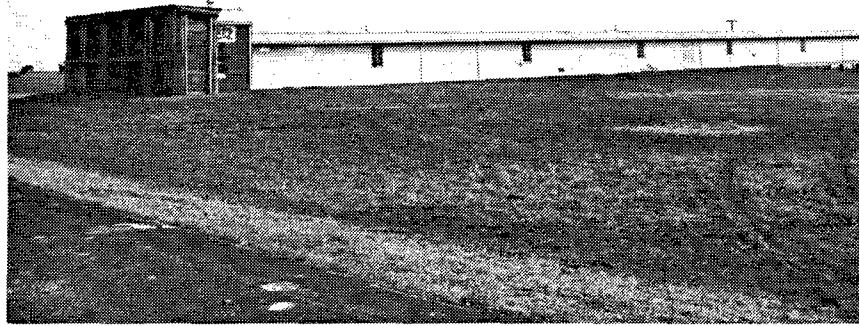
Building 502: Service Magazine with barricade (Building 525). Powder entered Kansas Army Ammunition Plant lines at facilities such as this one.
